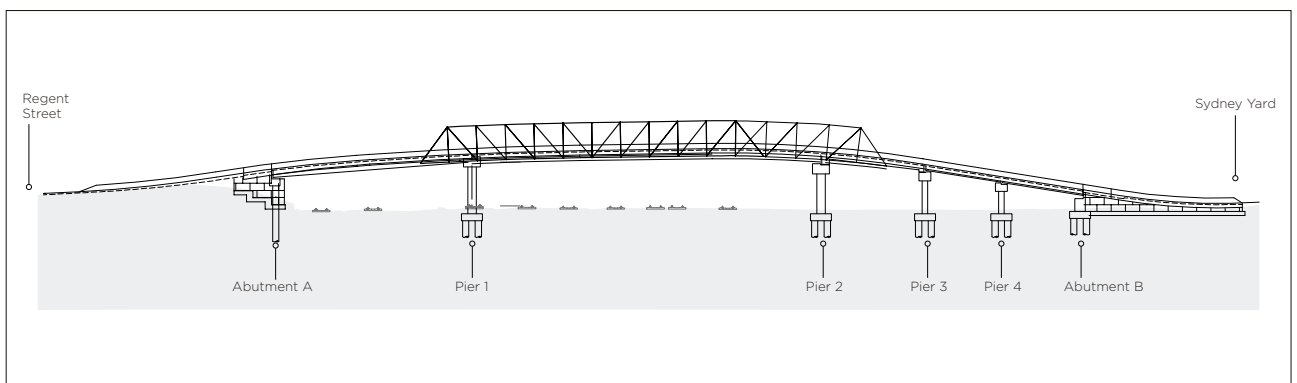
Sydney Yard Access Bridge – indicative long section
